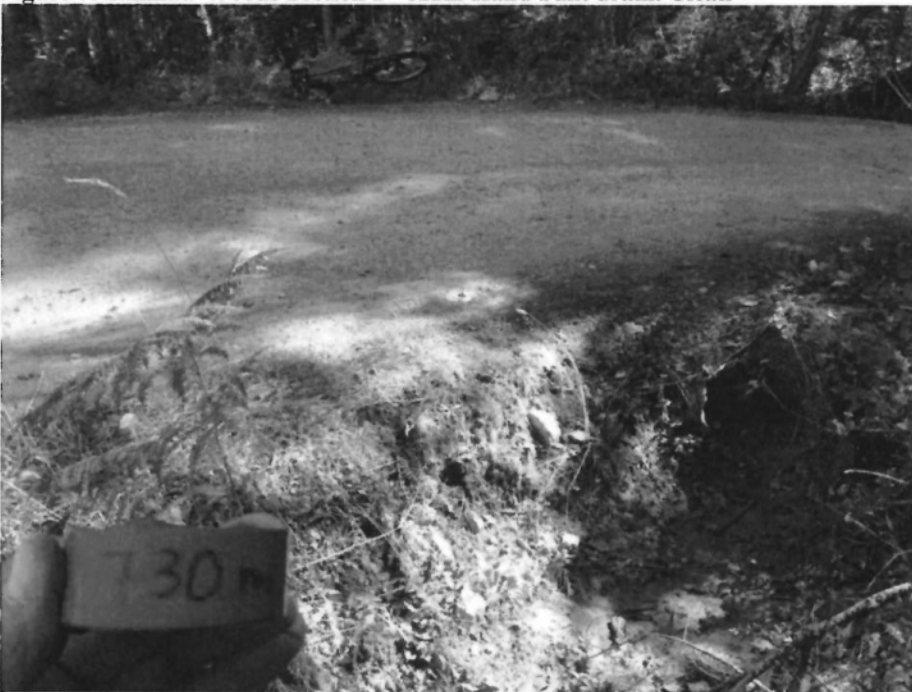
Sakinaw Woods Section 1 - 370m Culvert
